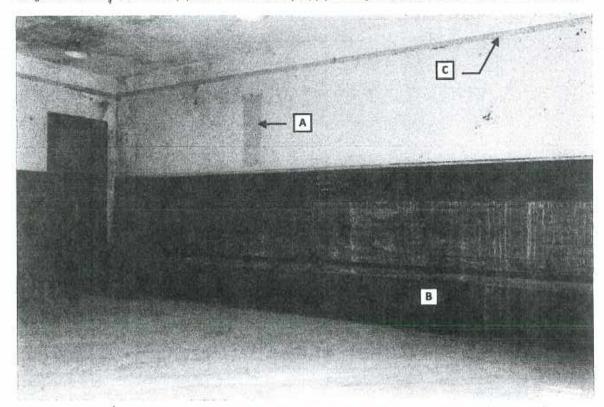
Room 1¢ view east. (A) Wall clock ghost mark, (B) Trimmed wainscot, (C) Ornamental picture rail.
